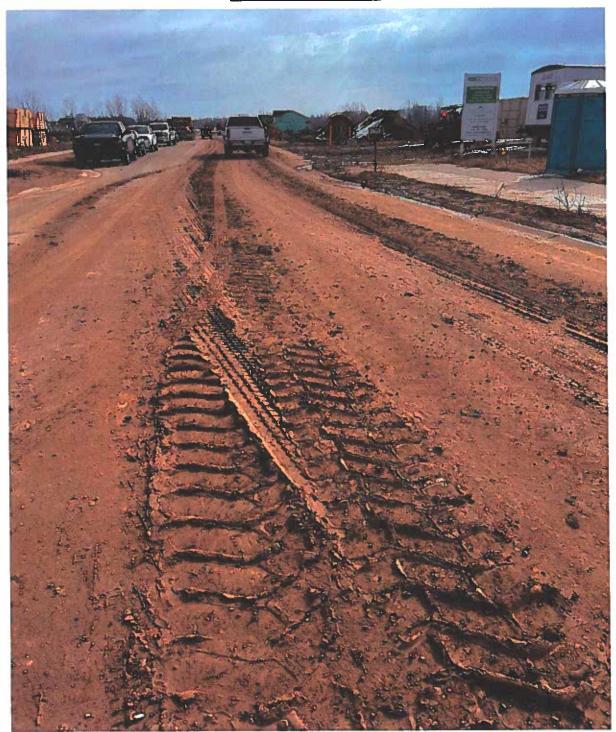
Tracking due to lack of controls at construction entrances. Stone needs to be installed and maintained to help eliminate tracking.
